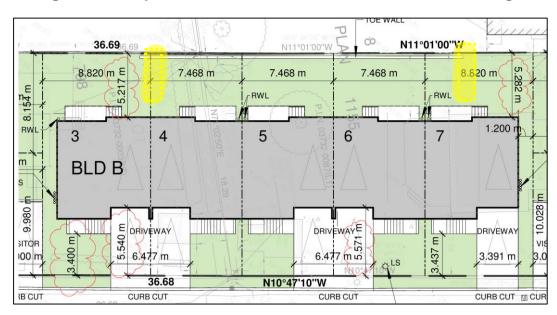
Proposed Rear Yard Setback – Townhouse Dwellings
